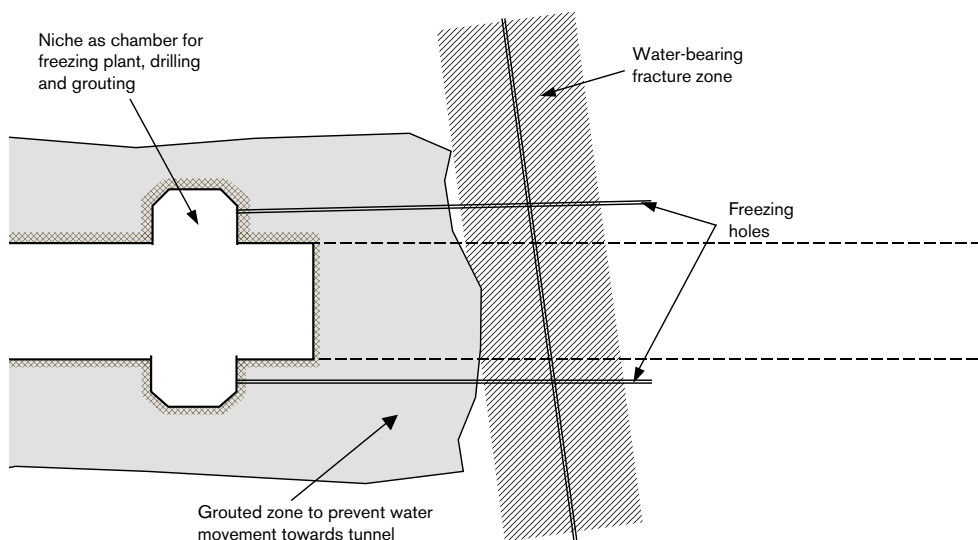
Pre-grouting to limit water movement towards the tunnel.
